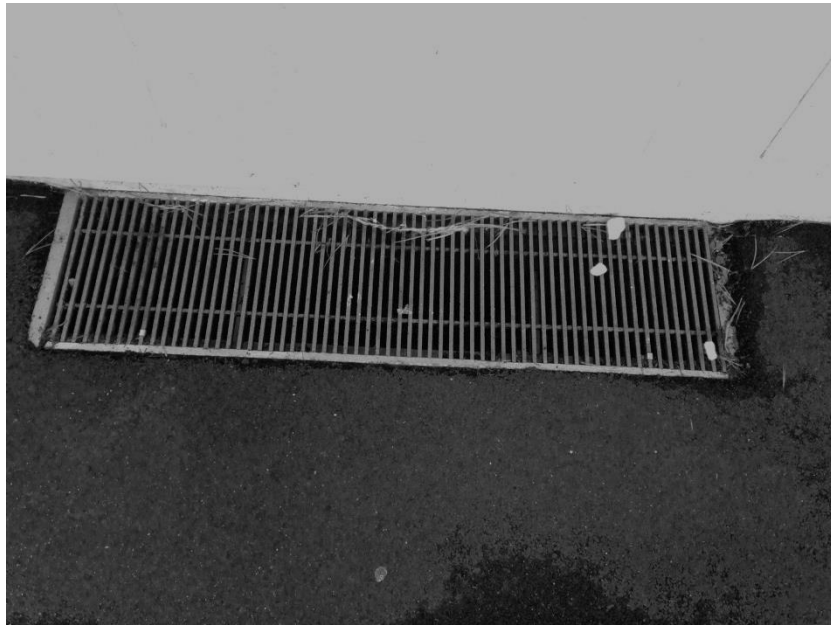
4 feet (length) by 1 foot (width) feet air vent
